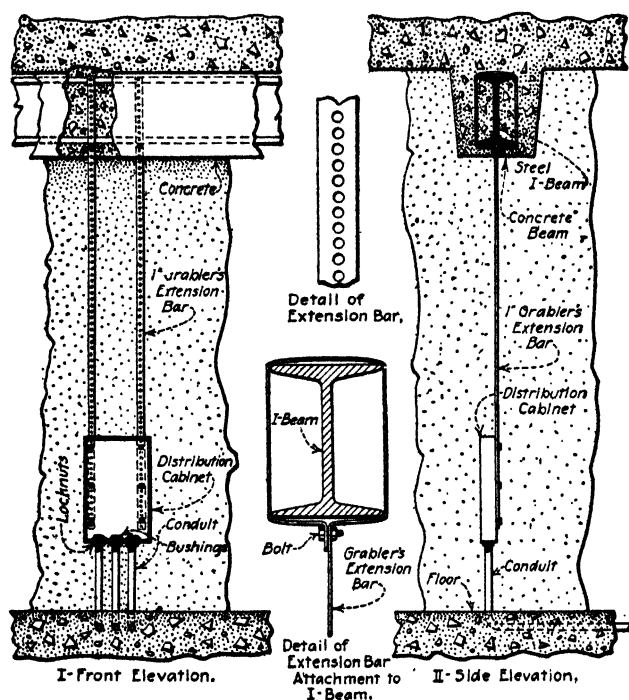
Supporting steel cabinet with Grabler's extension bar.
